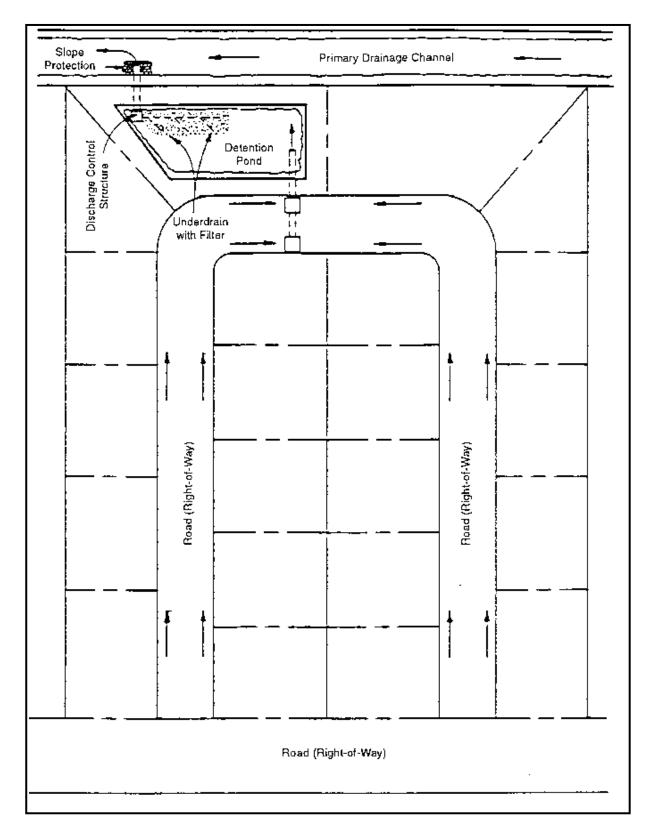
Typical Subdivision Layout Showing On-Line Detention Pond and Outfall
